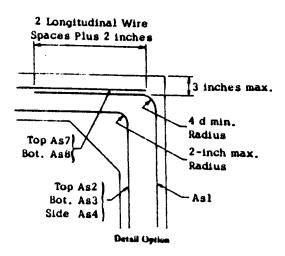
CONCRETE BOX SECTION REINFORCING STEEL (I)
